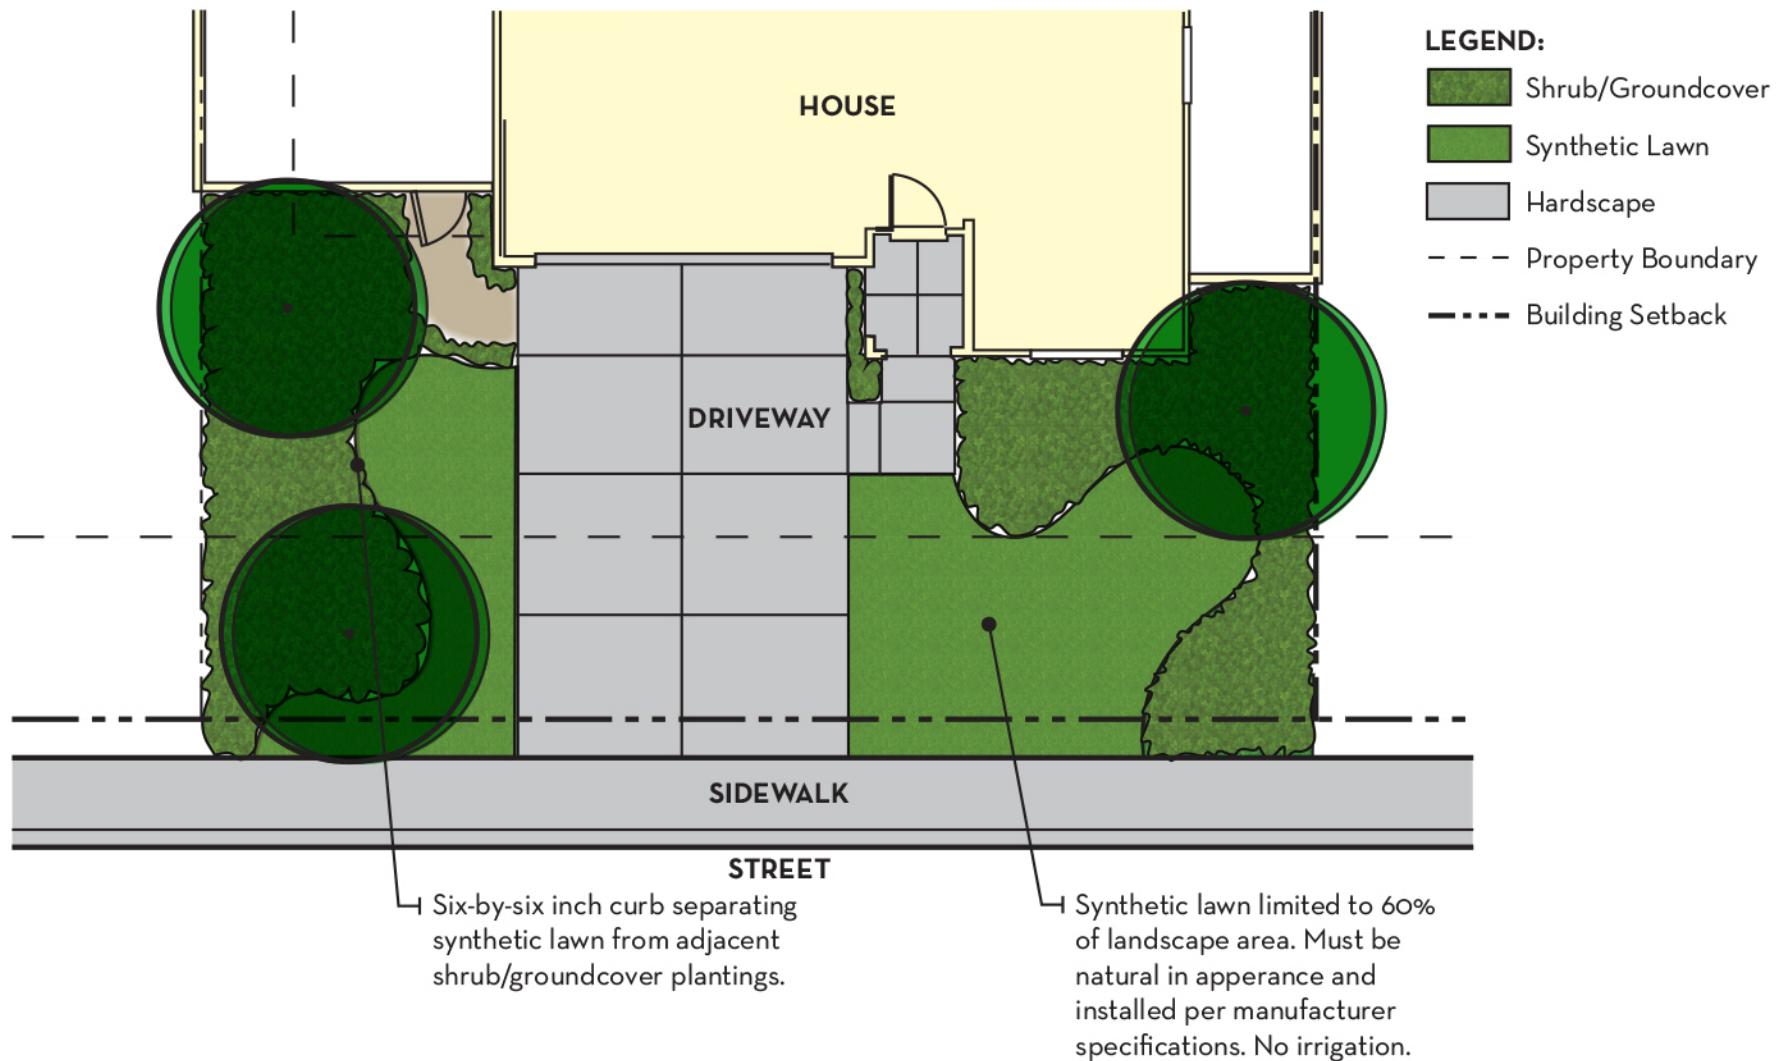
Synthetic Lawn and Plants Conceptual Landscape Plan
